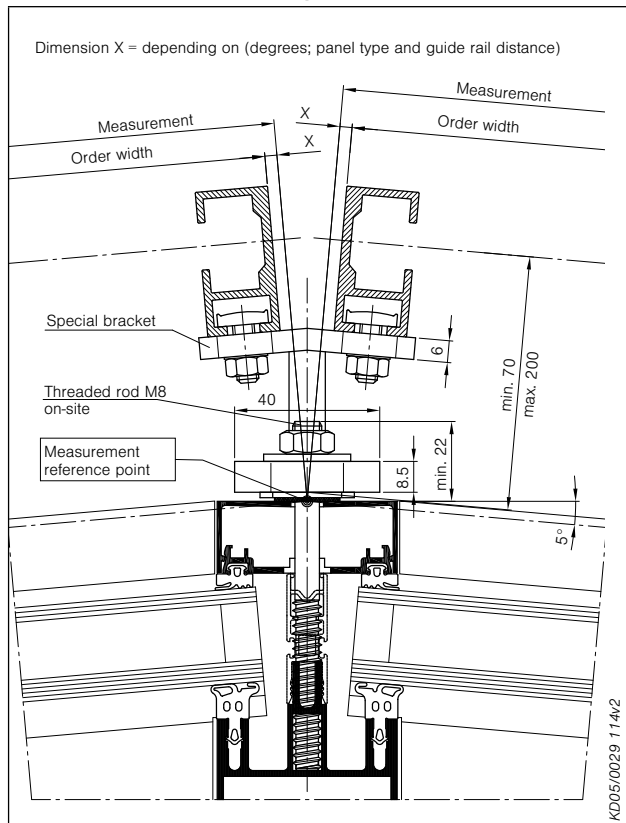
Guide rail bracket for guide rail 40x20 (polygon facade – individual units only)
